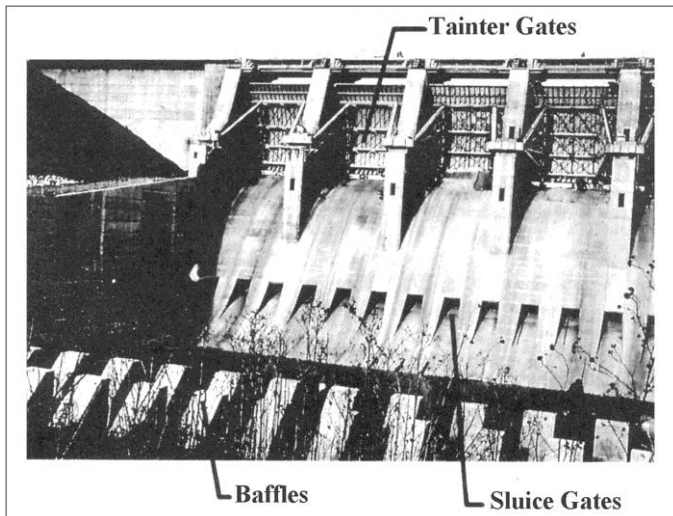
Photo of Red Rock Dam Control Structure showing gates and baffles. Photo from US Army Corps of Engineers.
